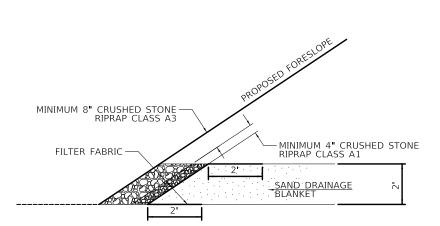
DETAIL - SAND DRAINAGE BLANKET - CROSS-SECTION (NOT TO SCALE)
